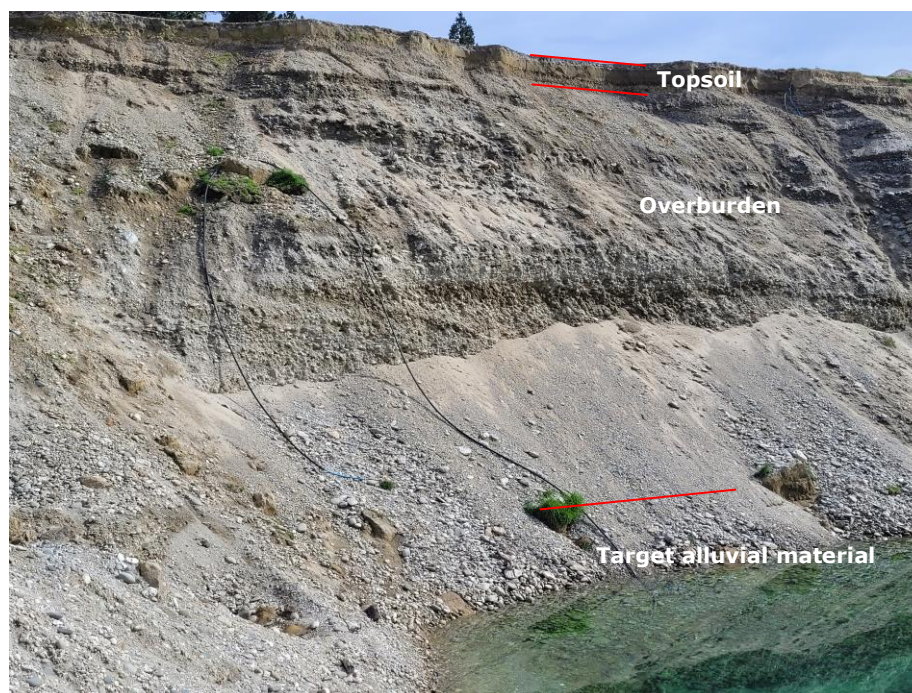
Test pit wall illustrating the extent of the topsoil, overburden and wash.
